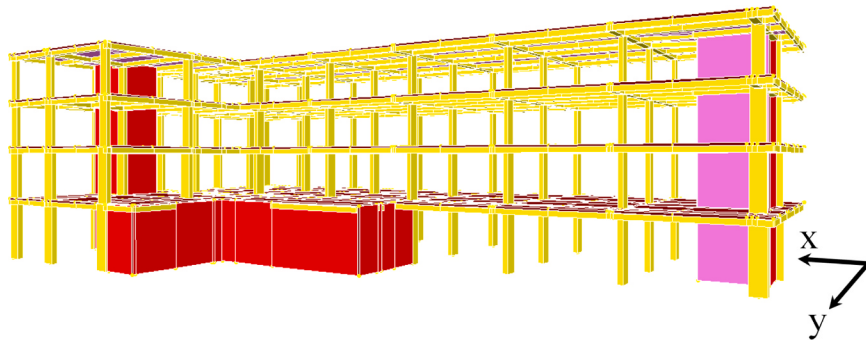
Three-dimensional Finite Element Model used: the superstructure is fully represented in geometry (frame elements for beams and columns and shell elements for walls) while foundation was represented by stiffness, damping and mass properties concentrated at base of columns. Coordinate system used is presented.
